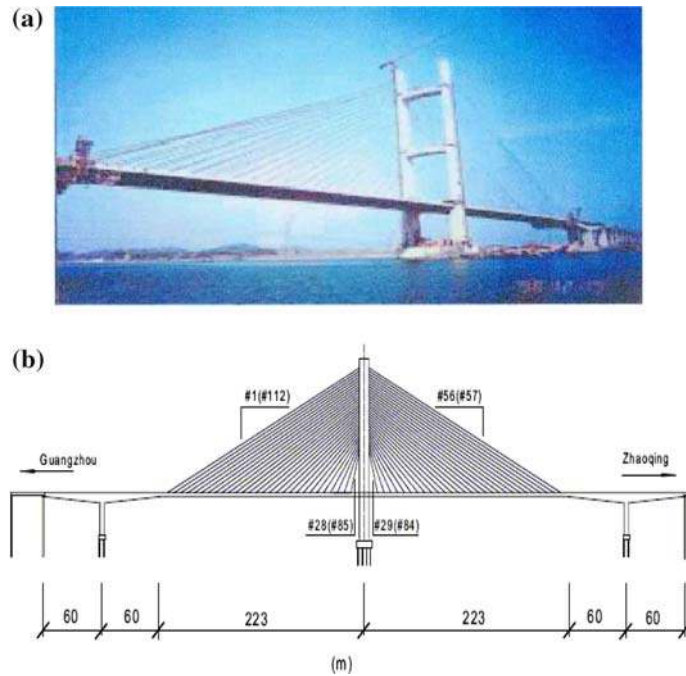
a View of the Jinma cable-stayed bridge. b Schematic dawning of the bridge with stay cables
